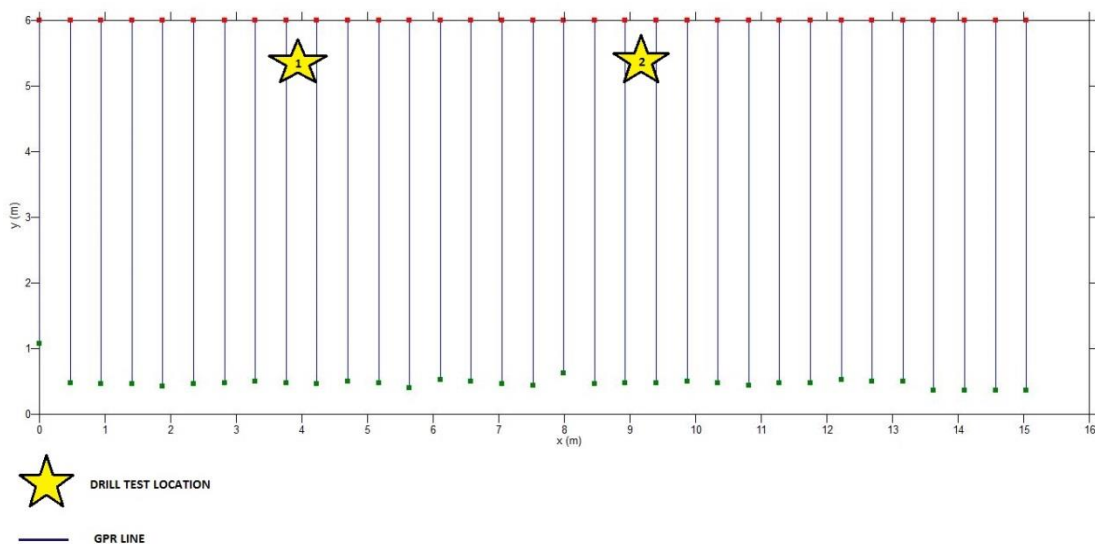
GPR Scan lines and drill test points – Abutment 3, Site A
